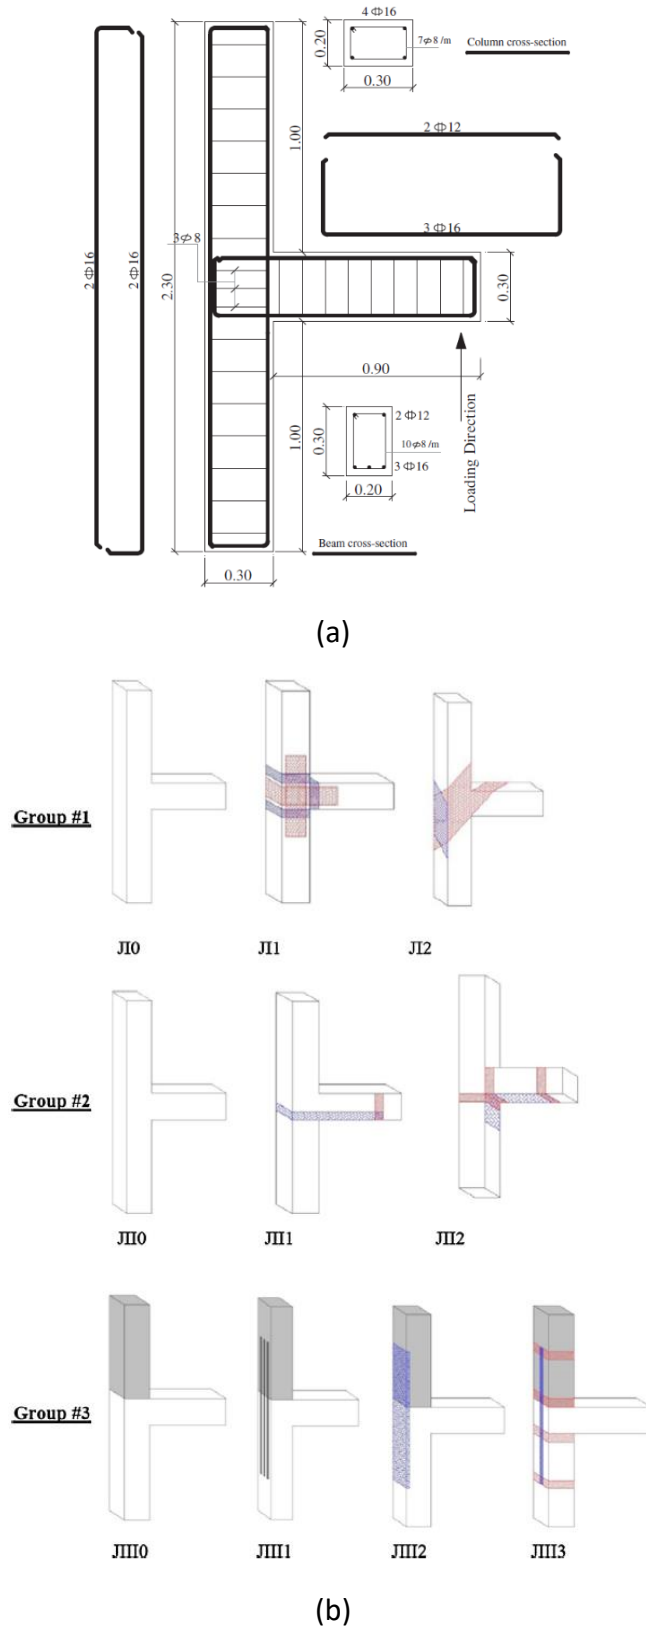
(a) Details of reinforcement and dimensions for the control specimen, J0; (b) Schematic configuration for the three groups of specimens tested (Mahmoud *et al.*, 2014).
